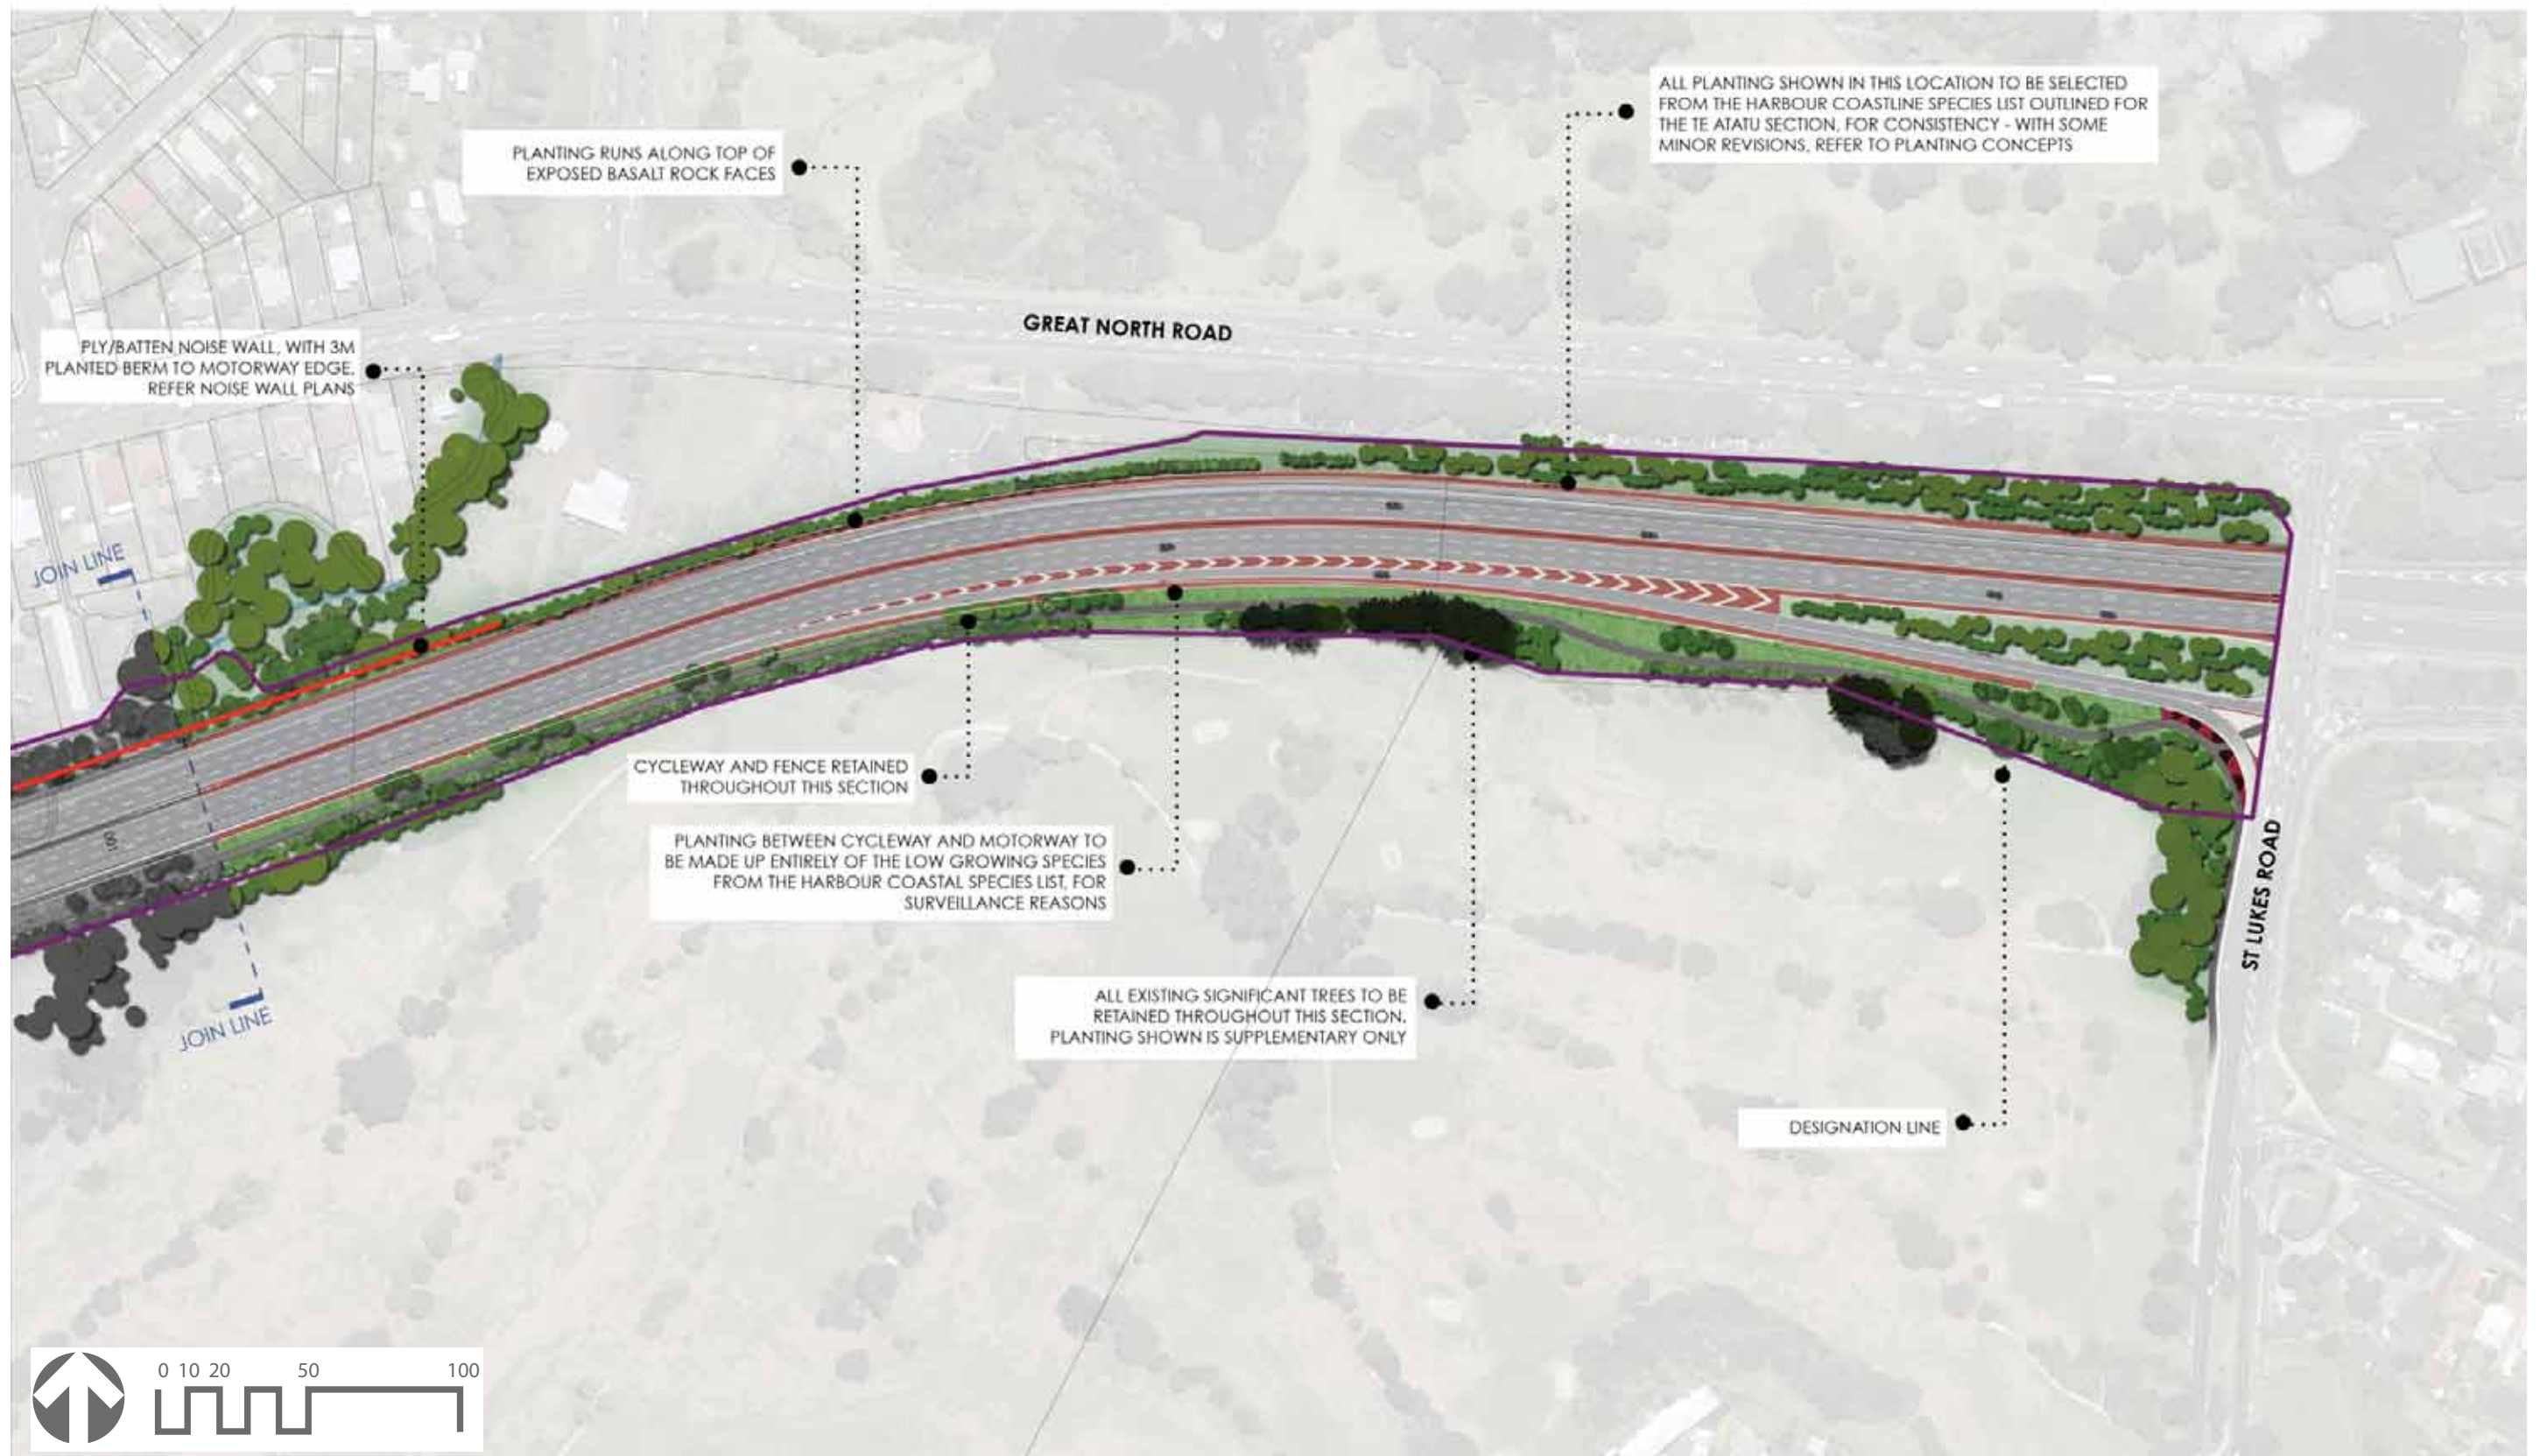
Waterview to St Lukes - concept plan (eastern section)
